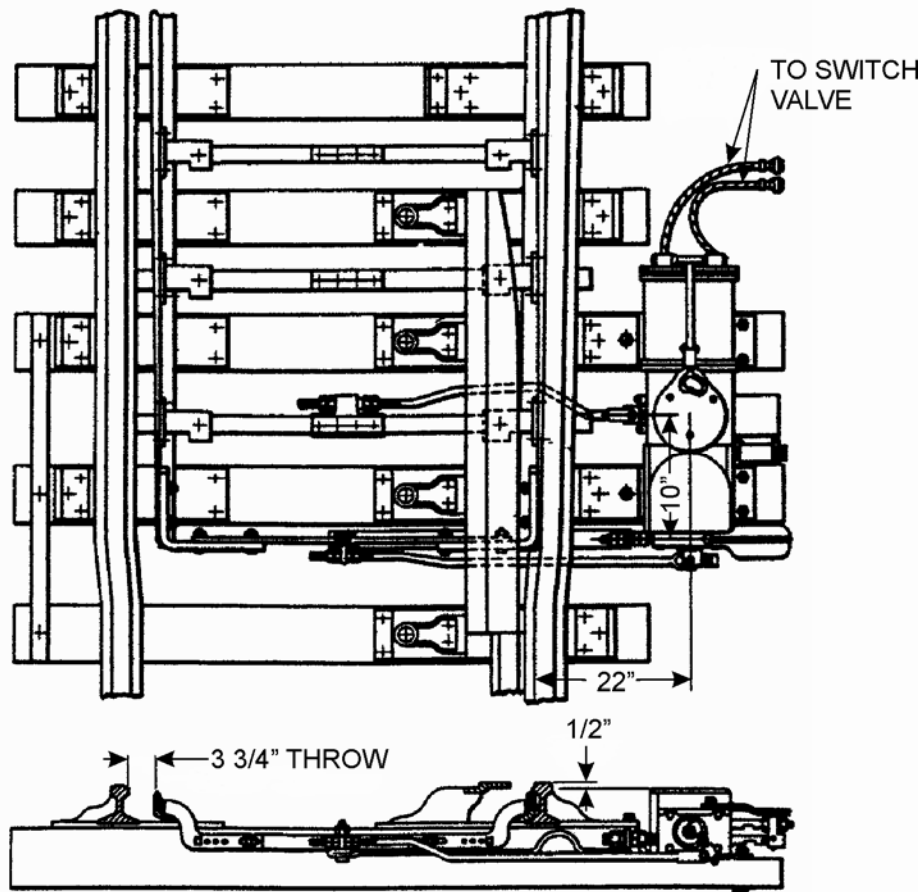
Typical Style A-10 EP Switch Machine Layout
